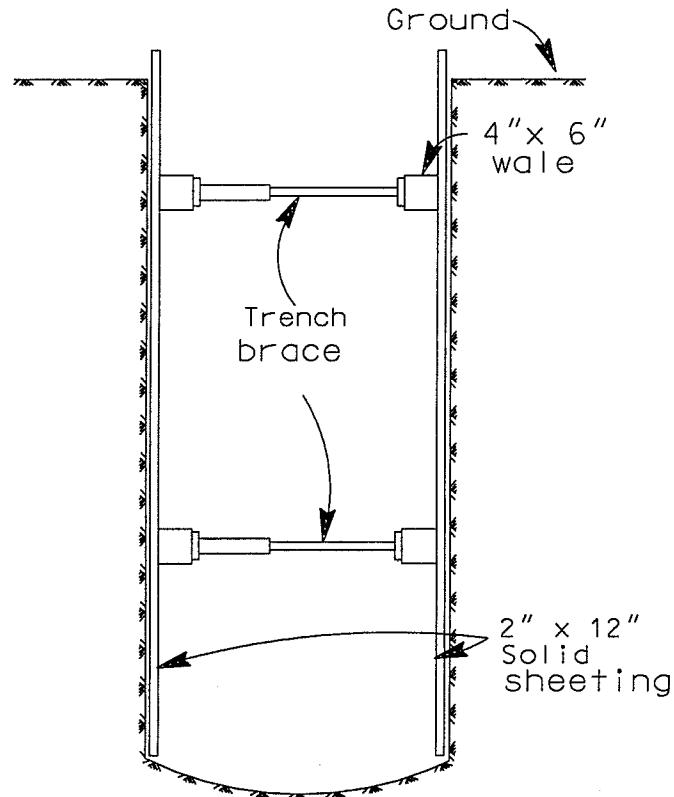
Trench Braces, Wales, and Solid Bracing
